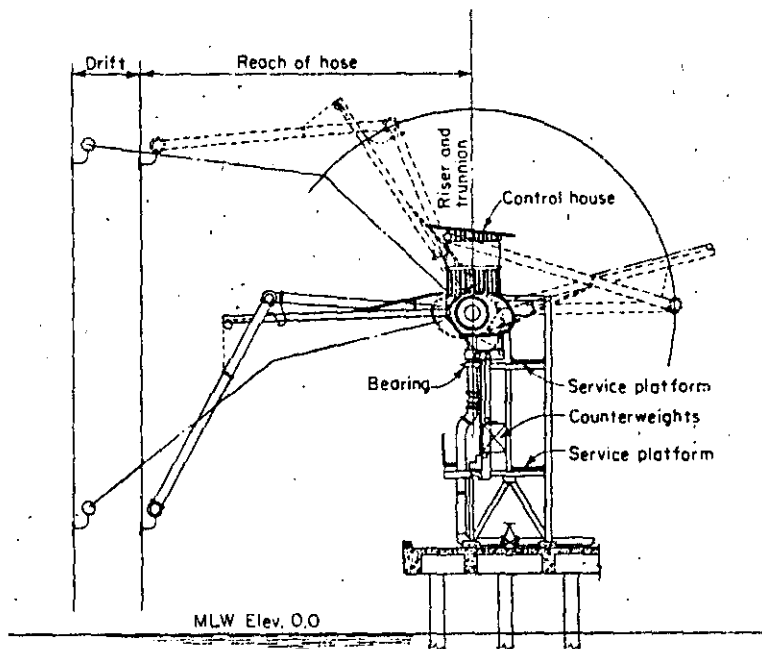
Installation using "Chiksan" hydraulically controlled marine loading arm. (Courtesy of the Chiksan Co.)
